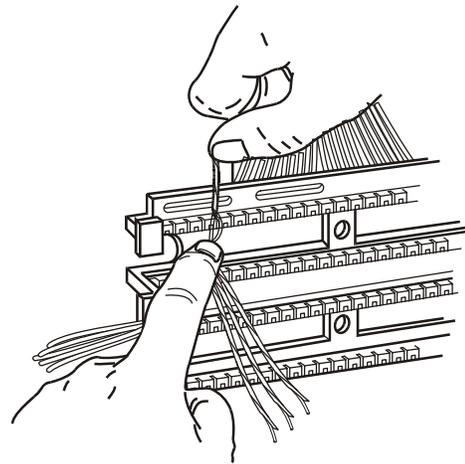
shows the steps used to terminate cables on the 110 wiring block. For cable wiring clarity, M32CPP/100 HCP consolidation box is not shown in Figure 8. Figure 9 shows an M32CPP/ 100 HCP consolidation point box fully wired.
